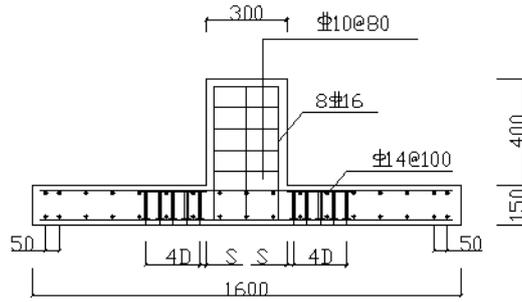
The profiles of the recycled concrete two-way slabs with anchor bolts
